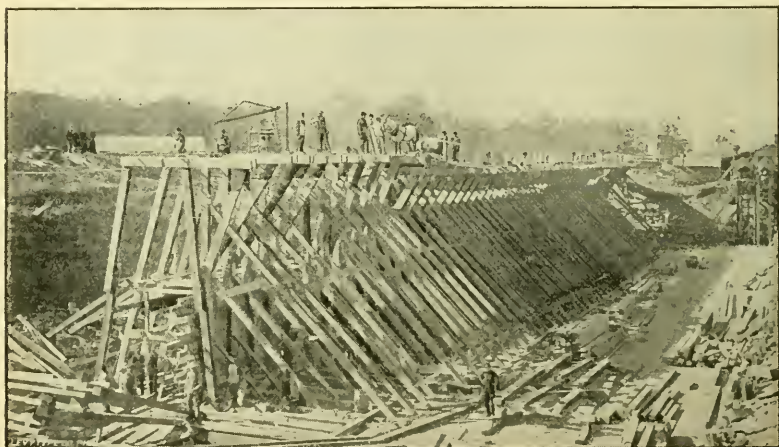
CONSTRUCTING SOUTH WALL OF LOCK 37 (OCT. 25, 1893).
